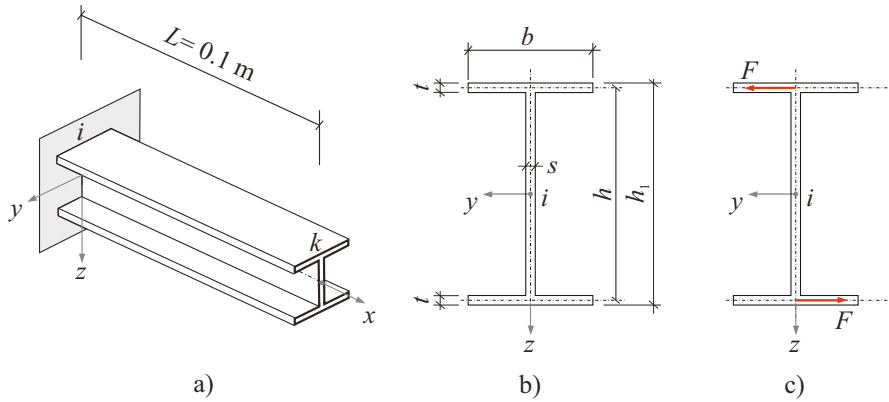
Cantilever beam with an I cross-section: a) system, b) cross-section, c) applied forces ($F = 114.3\text{ N}$).
